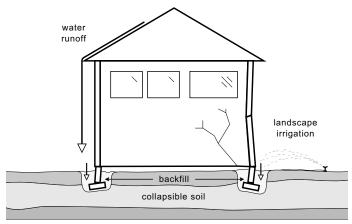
Possible damage to foundation and house from soil collapse due to infiltration of roof runoff and landscape irrigation water.
